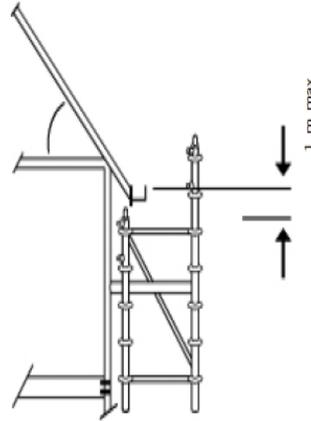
Scaffolding as edge protection for roofs greater than 35 degrees pitch (end guardrail omitted for clarity).
